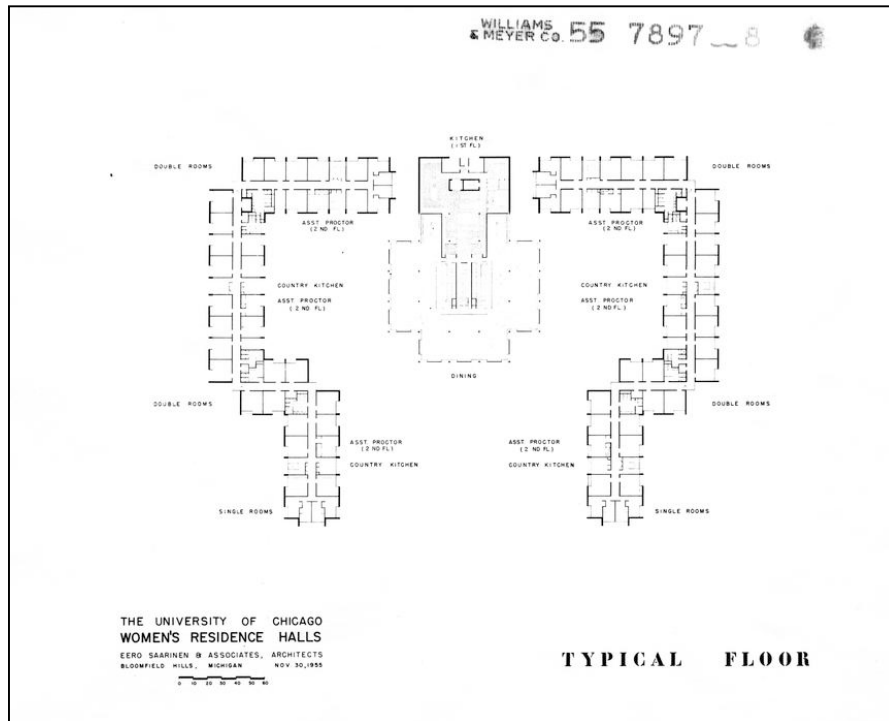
Original floor plan for Woodward Court. It was later altered to move the dining hall entirely south of the building, separated from the neighborhood to the north. (Buildings and Grounds Photographs. UCSC).
